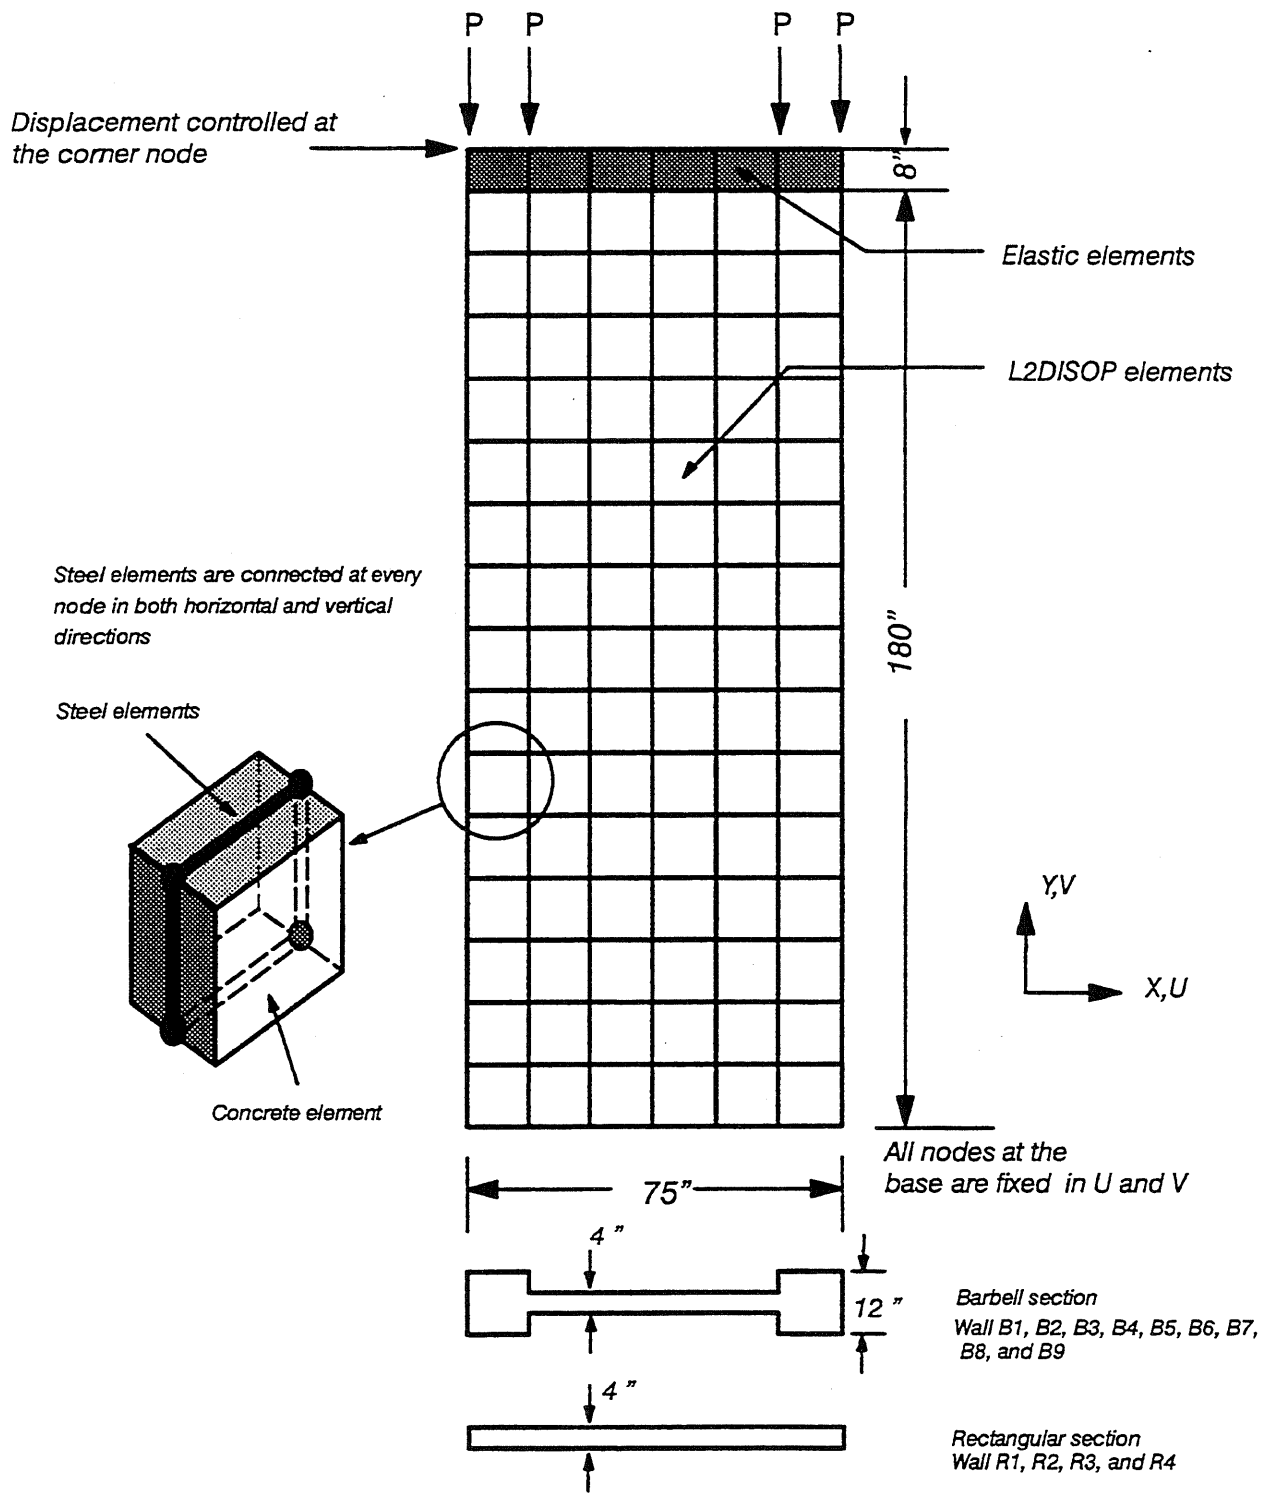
Finite Element Model for a PCA Wall Specimen
